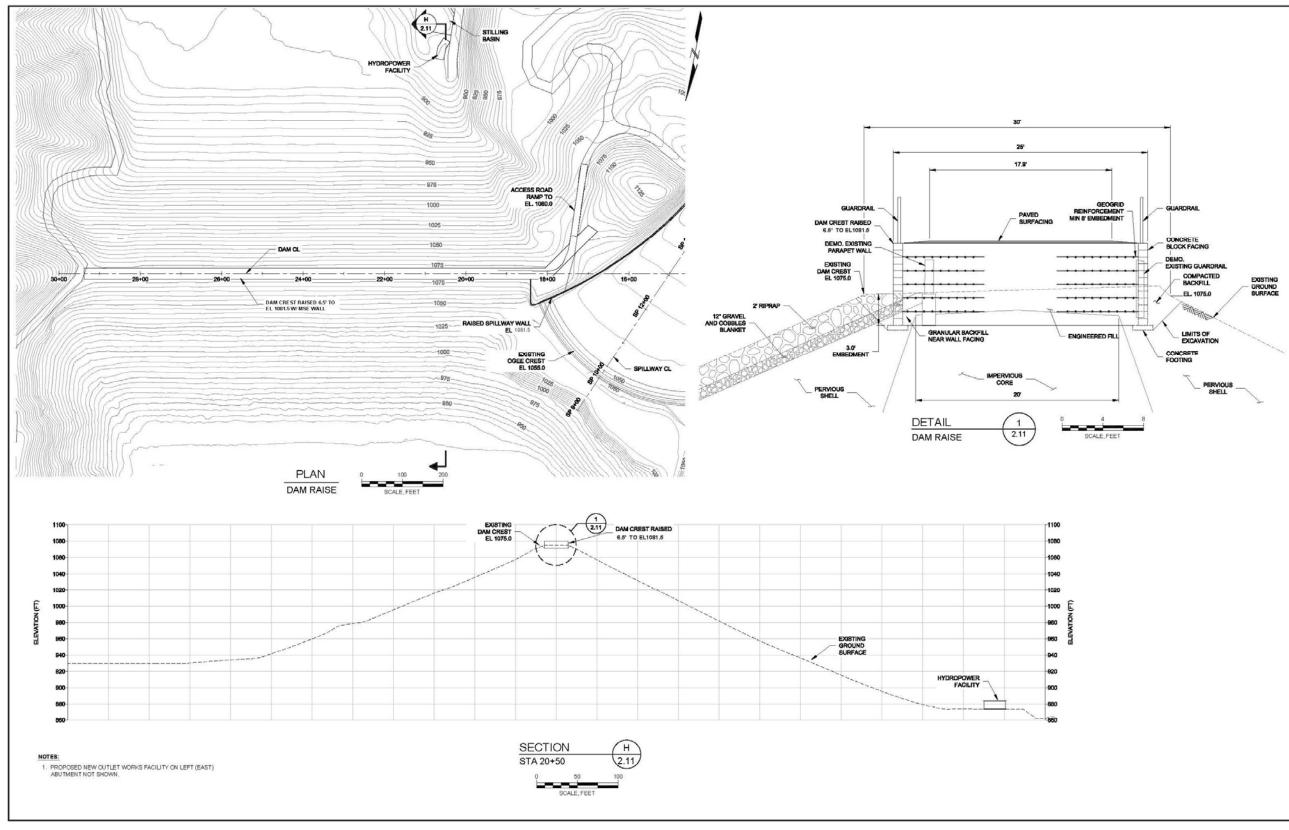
Plan, Profile, and Section Views of Dam Crest Raise
